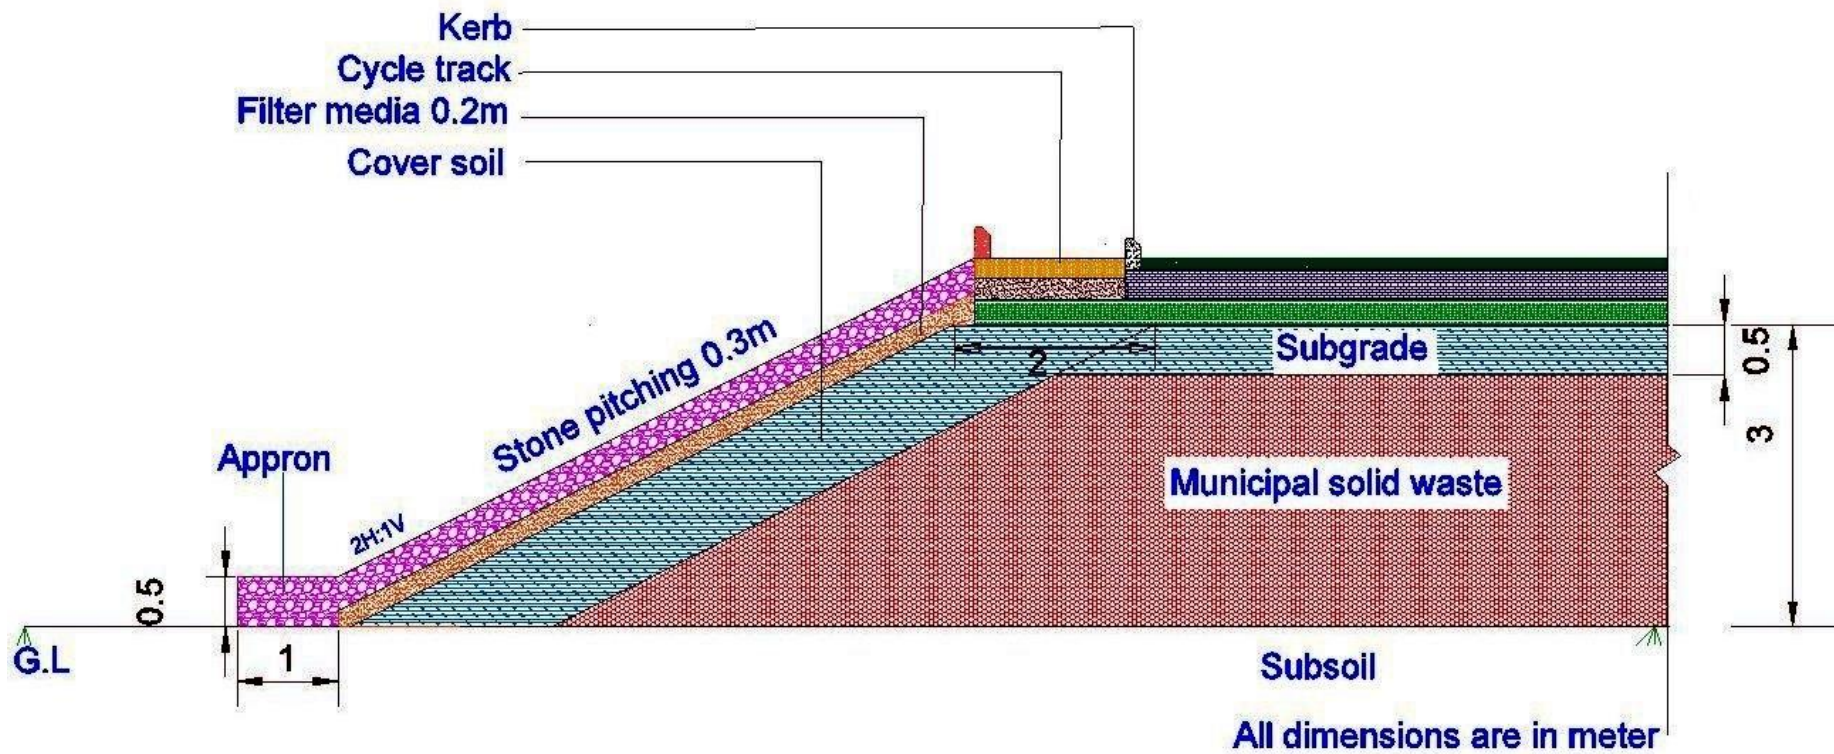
Cross –section for construction of 3m Height MSW embankment (Built up Area)
